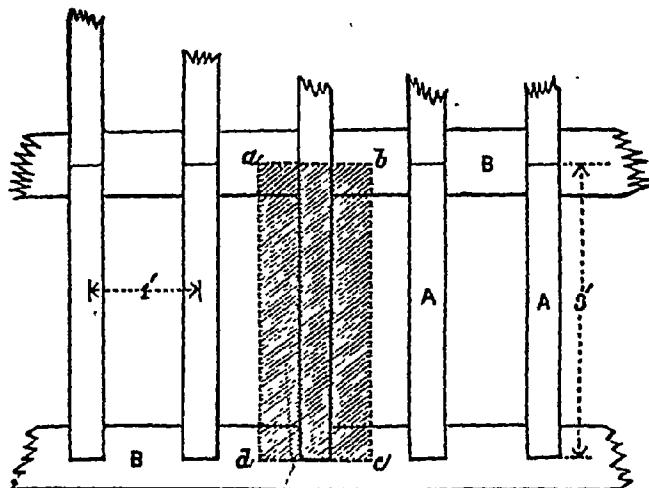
shows the area of roof supported by a burgah in a terraced roof. A, A are burgahs placed 12 inches apart from centre to centre; B, B the beams which support the burgahs are placed 3 feet apart from centre to centre. The shaded portion a b c d is the portion of the roof supported by any one burgah. Scale 2 feet = 1 inch.
